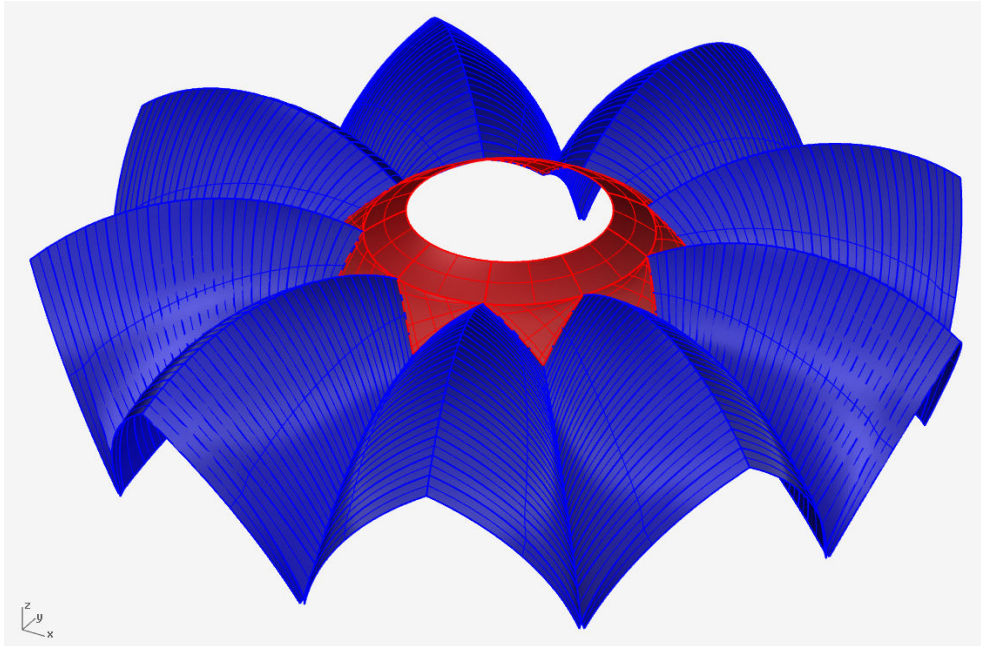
The outside spherical parts (blue) have a radius of 16500 [mm]. The inner spherical part has a radius of 24000 [mm].
